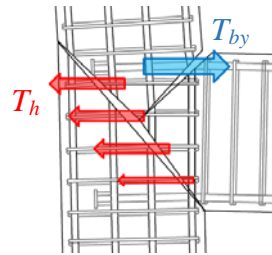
Details of the exterior beam-column joint specimen (T15-50TC5)
